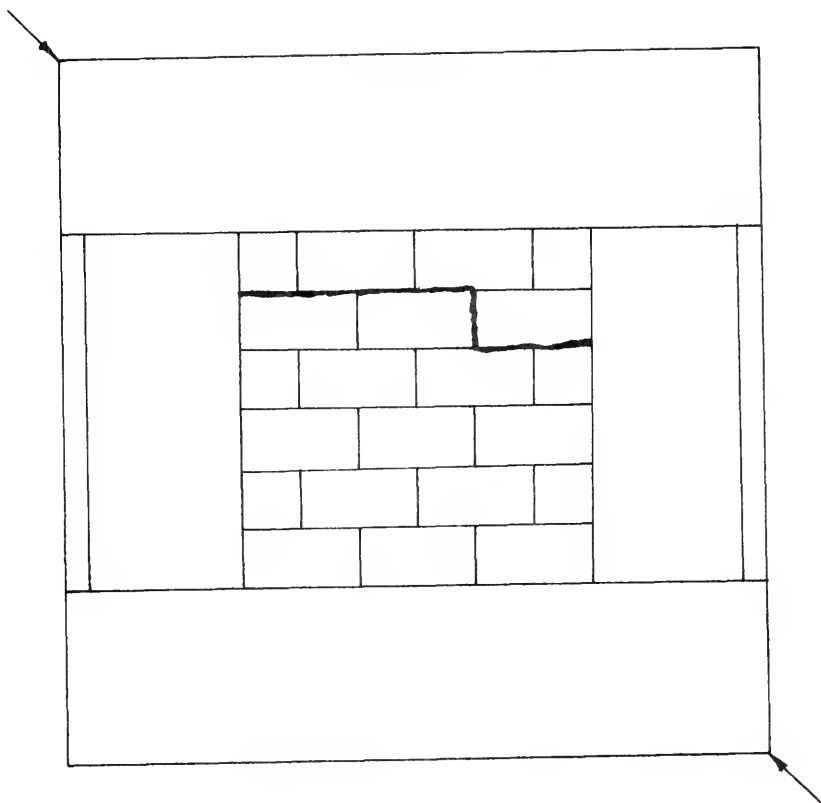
Failure pattern of hollow pier PR 6
